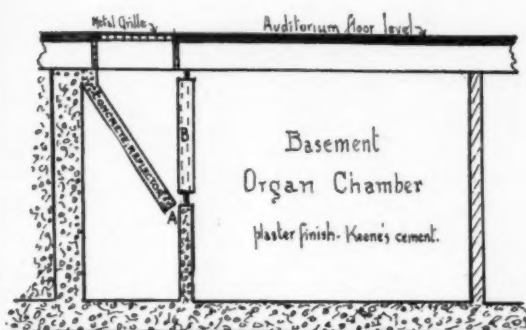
Section of basement floor showing organ chamber and method of deflecting sound to the floor grille
